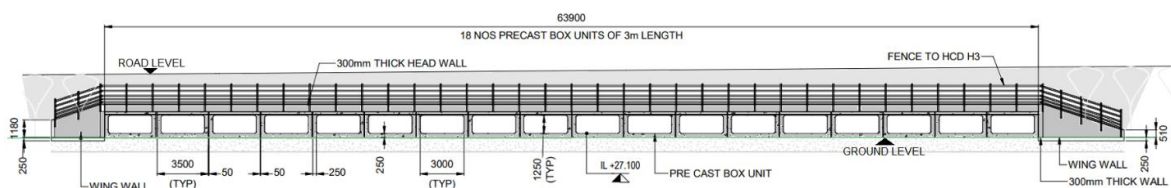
Elevation of the flood alleviation culverts in the Scheme design
